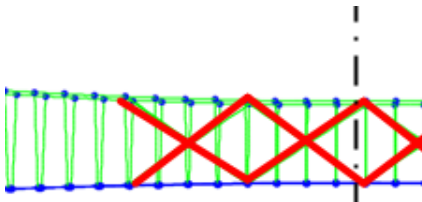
Vertical Bracing Pattern at Center of 80 m Span Footbridge
